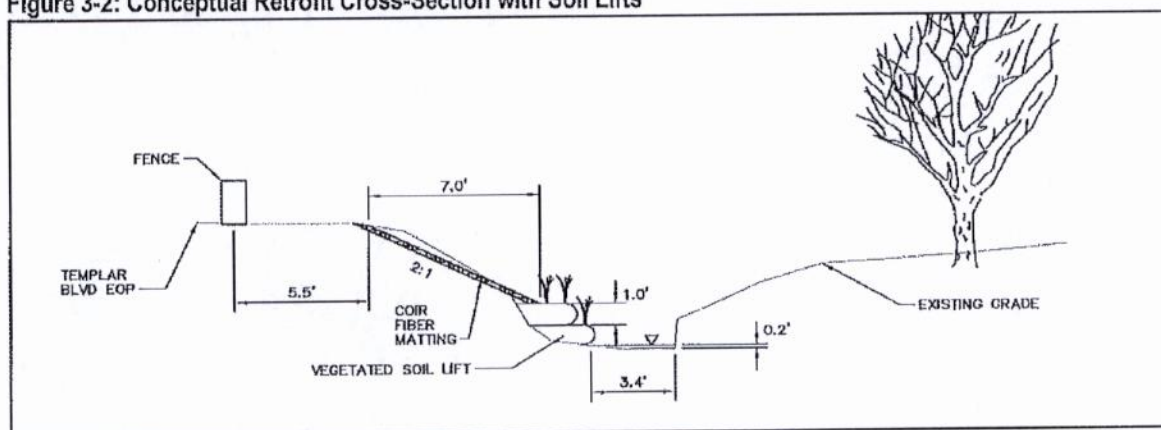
, above, depicts the conceptual retrofit plan and Figures 3-2 and 3-2 depict conceptual retrofit cross-sections. A full size conceptual plan and cross-section details are included as Appendix A. Stabilization would be performed in accordance with natural channel design techniques and would include re-grading the existing vertical bank to create a stable slope and wider flood prone area, create a bankfull bench, and establish vegetation along the bank by adding topsoil, establishing herbaceous cover, and planting shrubs and trees. This work would also include correcting the profile of the channel to improve riffle-pool sequencing which will in turn improve water quality and aquatic habitat. The proposed design would also add bed form diversity (riffles and pools) and structures such as rock cross vanes and log vanes can be used to improve bed form diversity and protect against bank erosion. In addition to the restoration of the left bank, the 3.5 feet wide area situated parallel to Templar Boulevard will be converted from managed turf to forest/open space through plantings and conservation.
